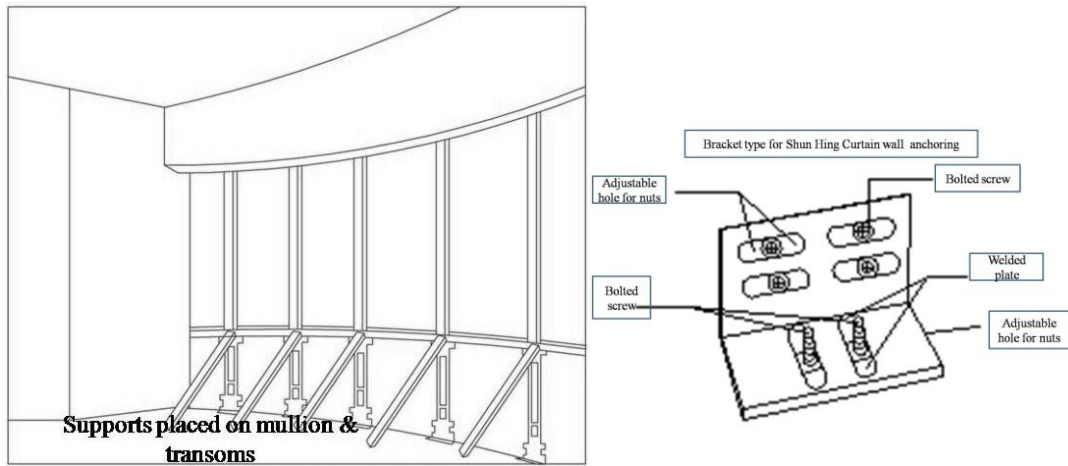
The erected mullions and transoms supported by inclined instrument to provide stability for the placement of the glass units and Brackets used for stick curtain wall type in Shun Hing Plaza (Drawn by Author)
